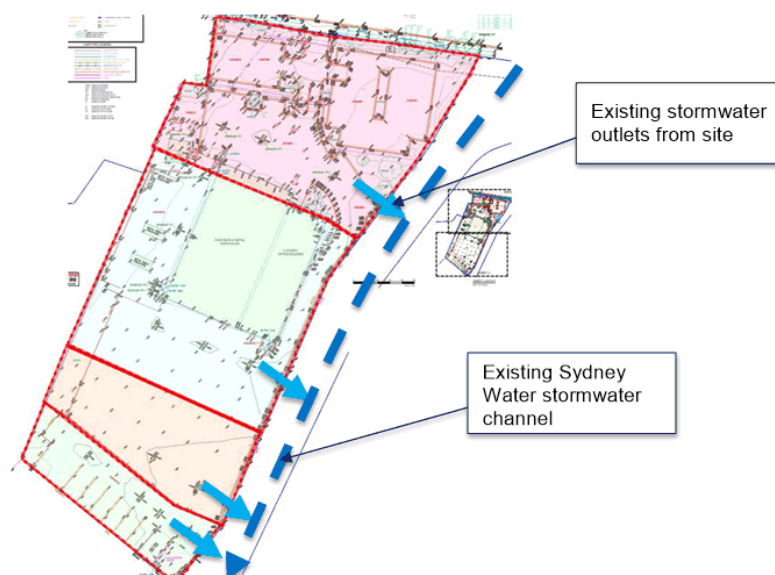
Approximate site sub catchments plan (73 Gardeners Road)
